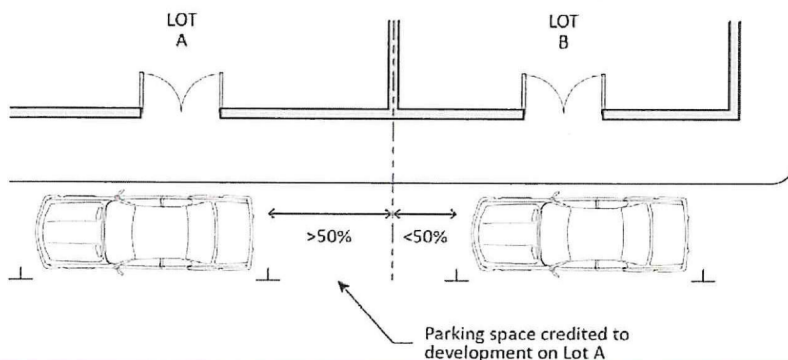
B.1: ON-STREET PARKING CREDIT
